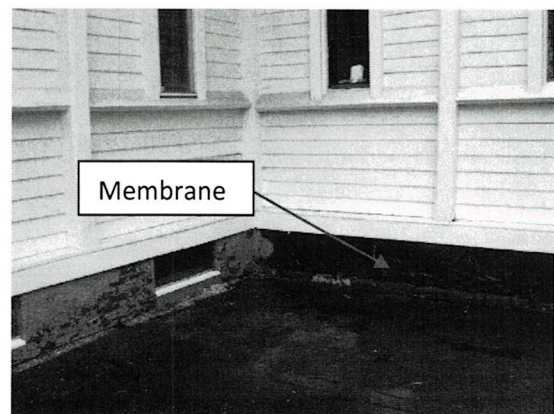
Brickwork has been fitted with a membrane under this roof valley.
